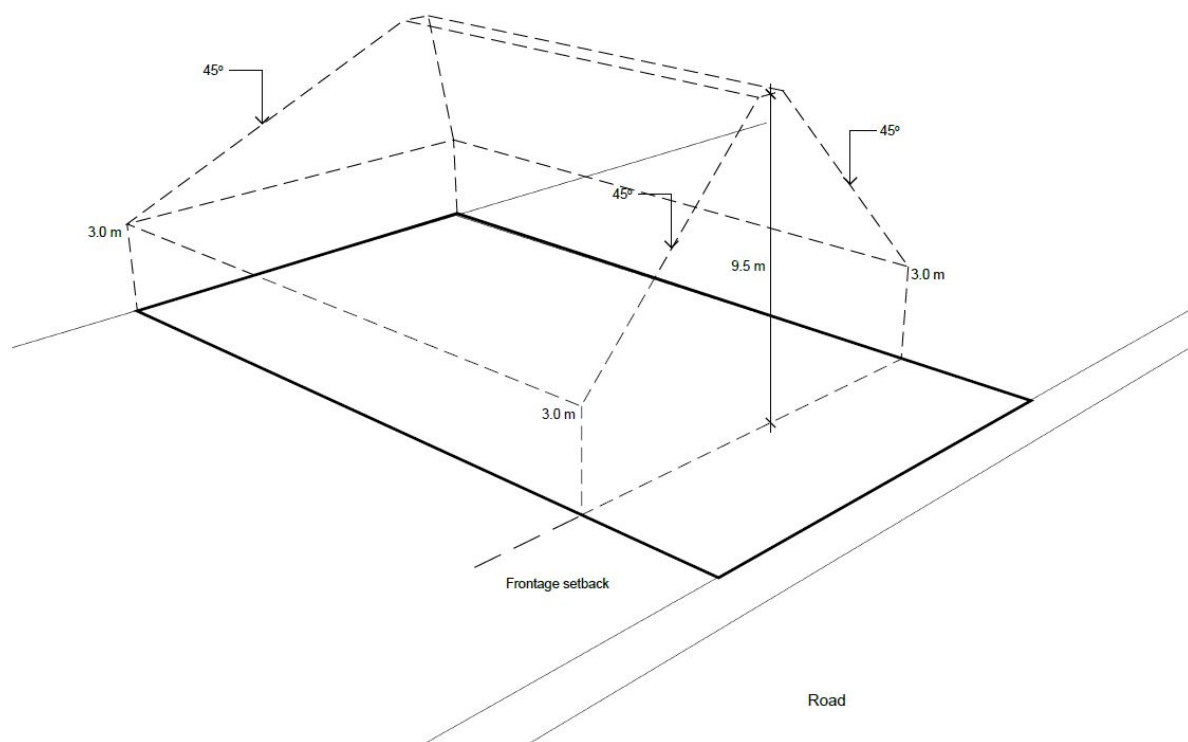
Building envelope as required by clause 9.4.2 A3(a) and clause 9.5.1 A2(a)
